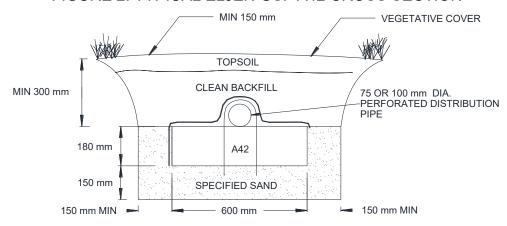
TYPICAL ELJEN GSF A42 CROSS SECTION
